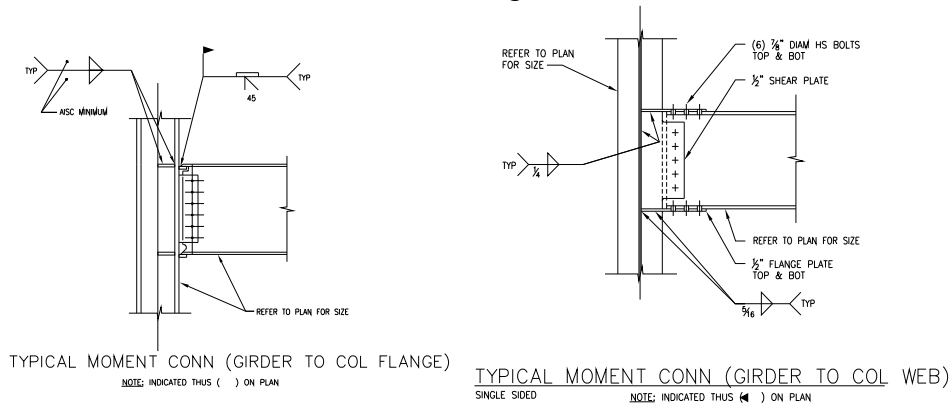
Moment Connection – Girder to Column Flange Figure 2. Moment Connection – Girder to Column Web
